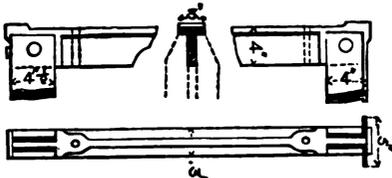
Front and Side Elevations of End Standards to 72-foot and 48-foot Trusses.
